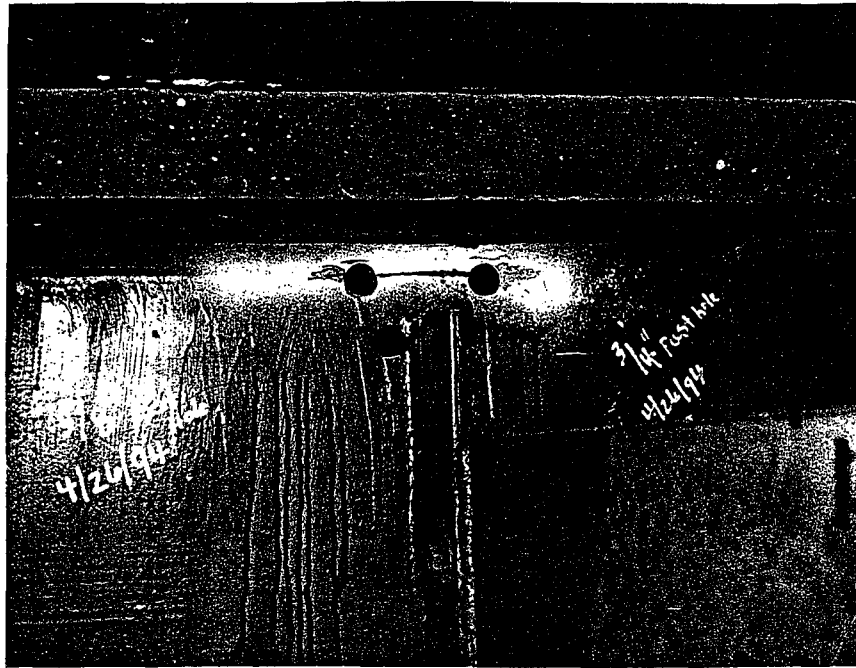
Web Cracks at Welded Plate Connection
